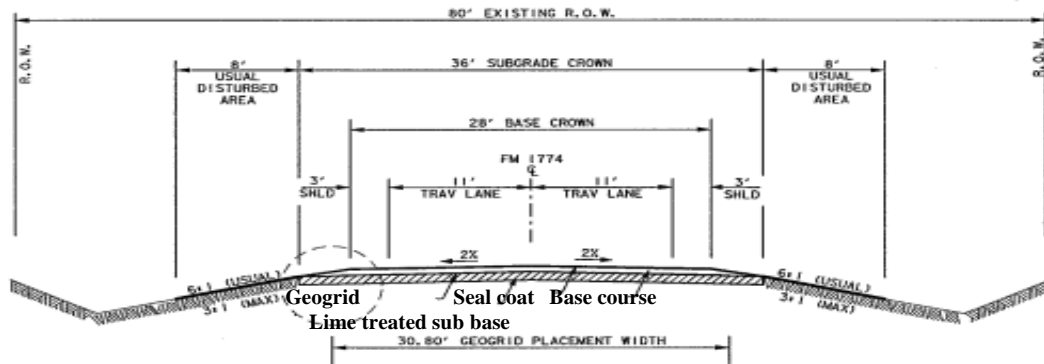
A typical geogrid reinforced pavement section at FM 1774
